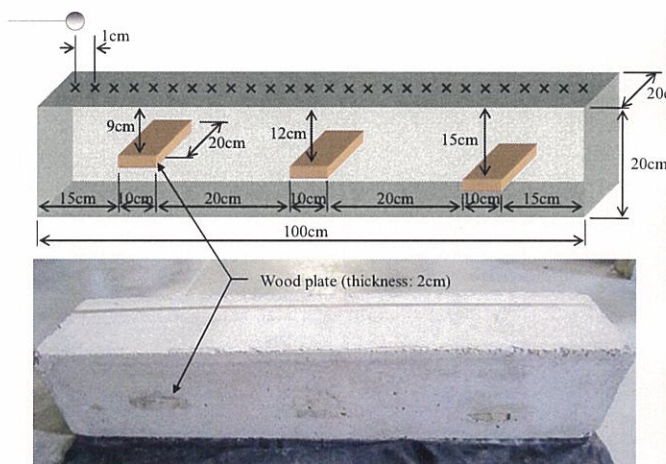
Dimension of the specimen having three artificial defects (wood plates)
